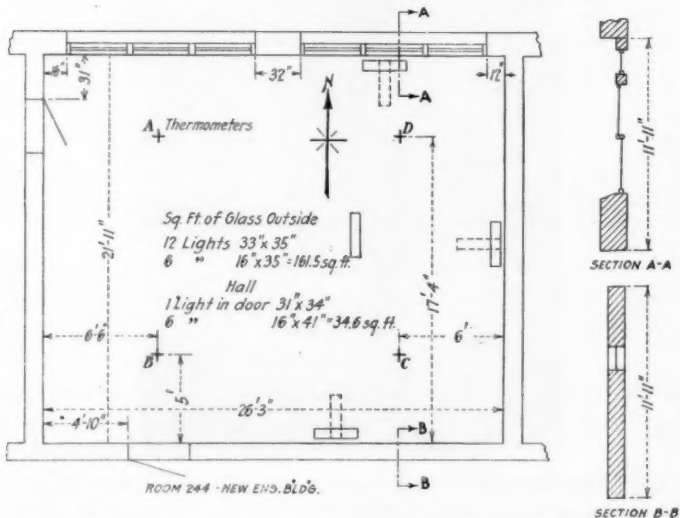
ROOM IN THE NEW ENGINEERING BUILDING IN WHICH TESTS WERE CONDUCTED.
